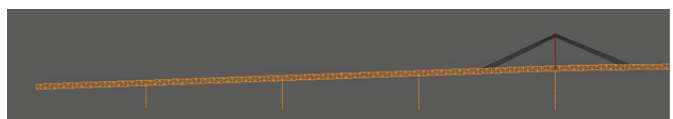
With the camber, cable shortening and dead load applied, the bridge deck profile is as planned.
